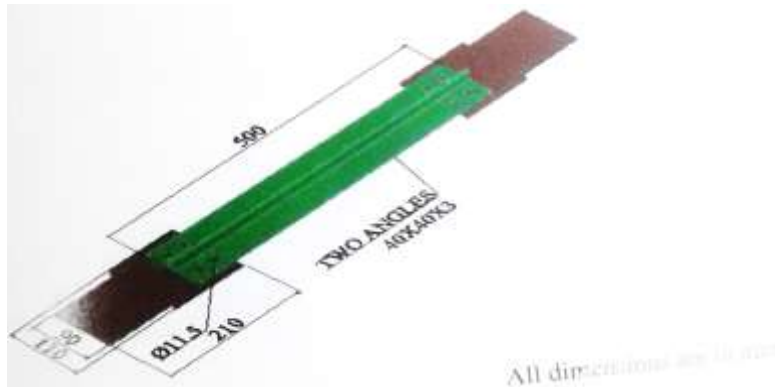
Details of double angle specimen connected to same side provided with bolts in single row
